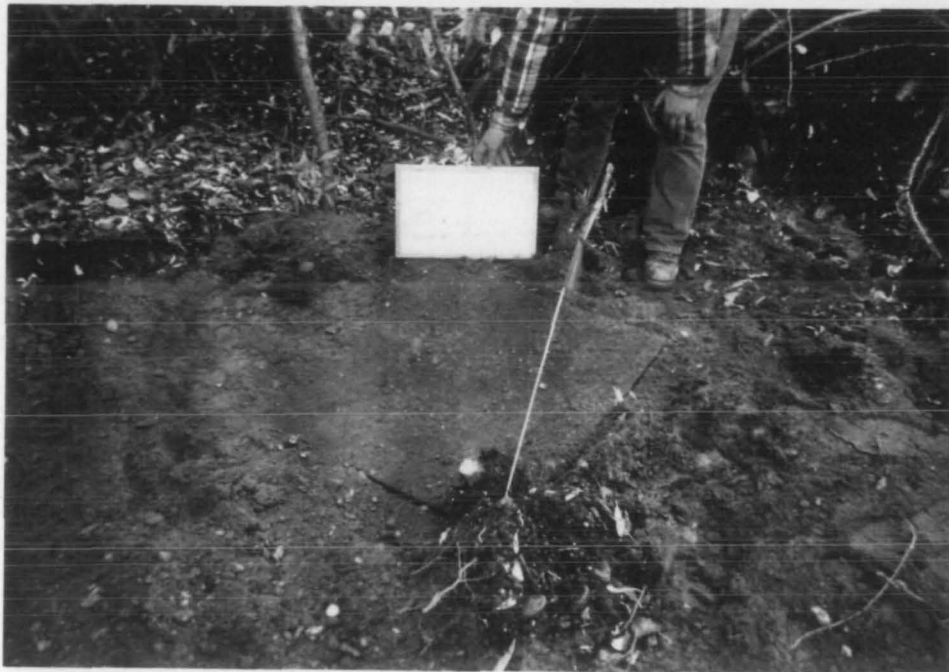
Test pit C, steel plate exposed and removed from excavation.
